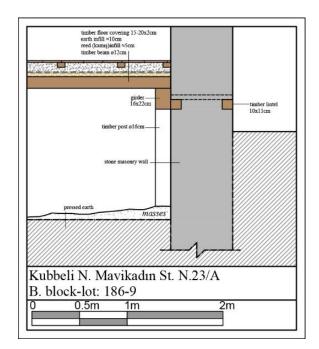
Drawing of flooring supported by timber girder located on the timber posts adjacent to the basement floor wall (Kubbeli N. b.block-lot:186-9)
